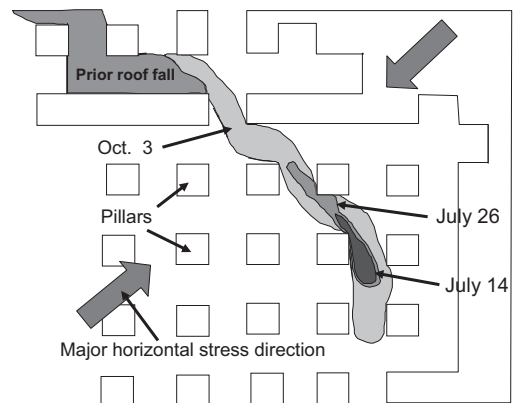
Plan view showing the development of a stress related roof fall in the direction perpendicular to the direction of the major horizontal stress, after Iannacchione et al. (2003)
